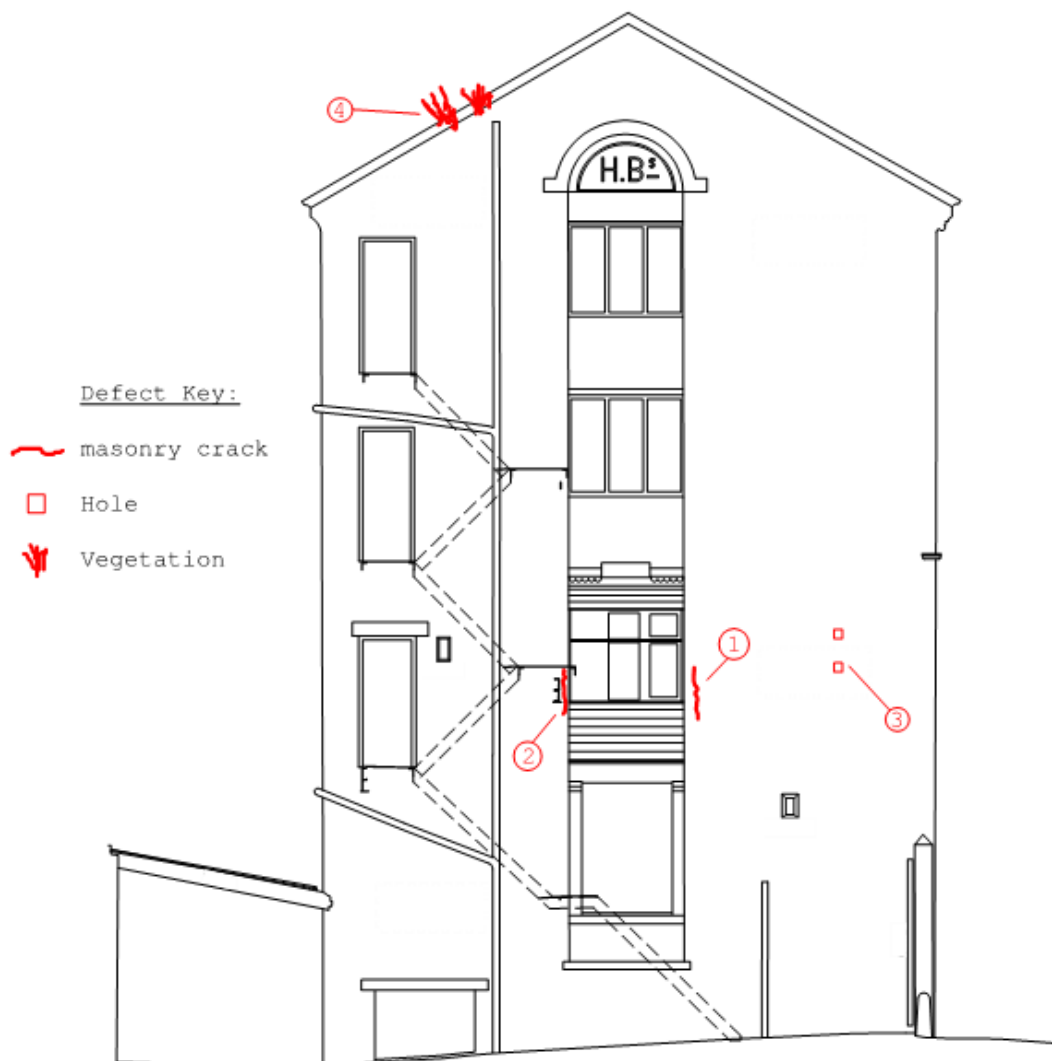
Frendsons Building East Façade Elevation Defects
